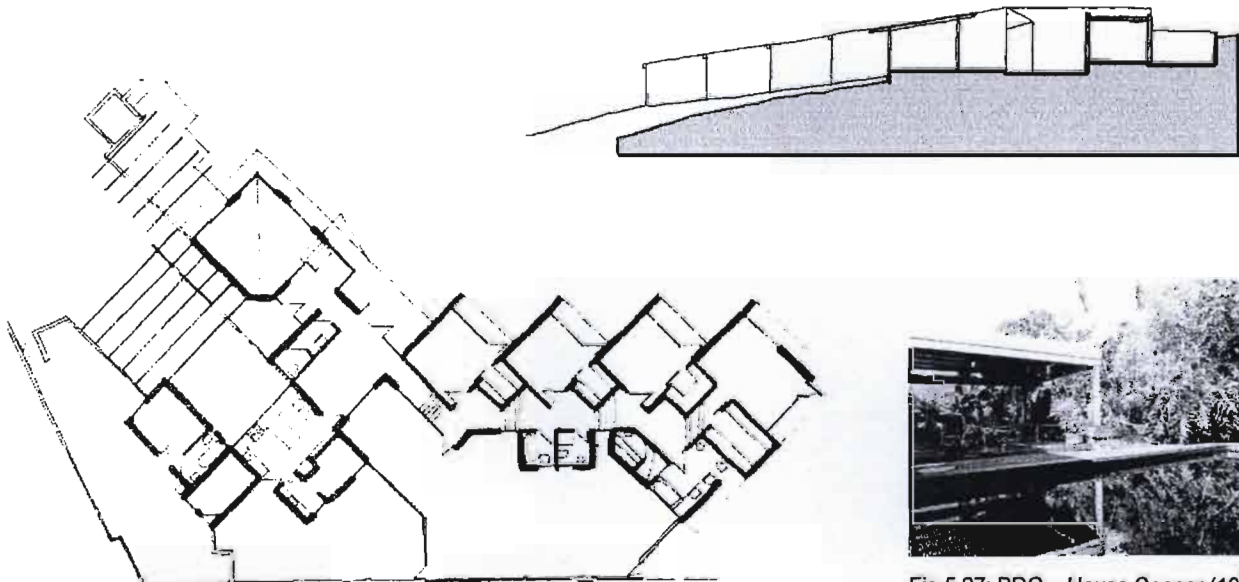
BDG – House van Eck (1971). Plan. Ref: Plan 74.3: p10.
